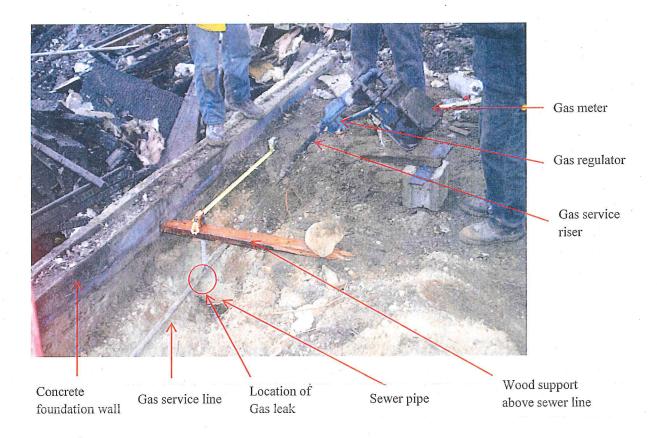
View of east foundation wall, location of service pipe, and meter set.-Photo taken September 26, 2011, by Al Jones, UTC engineer.
